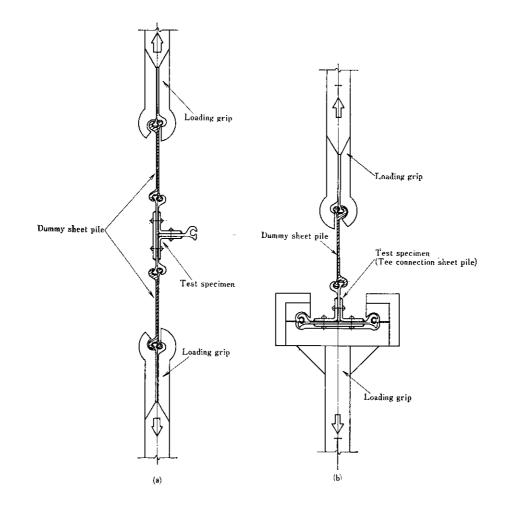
Testing method for "T" connection sheet pile specimen consisted of straight web steel sheet piles with high interlock tension
